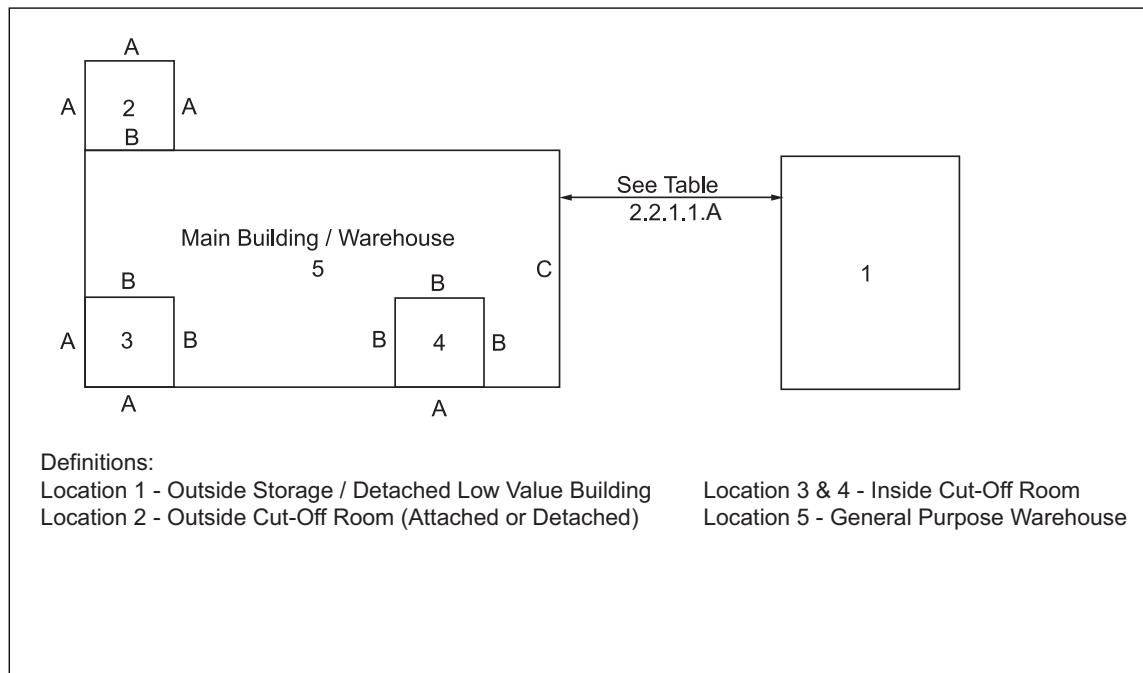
Location and construction of ignitable liquid storage areas: outdoor storage, detached low value buildings, detached protected buildings, and cutoff rooms.
